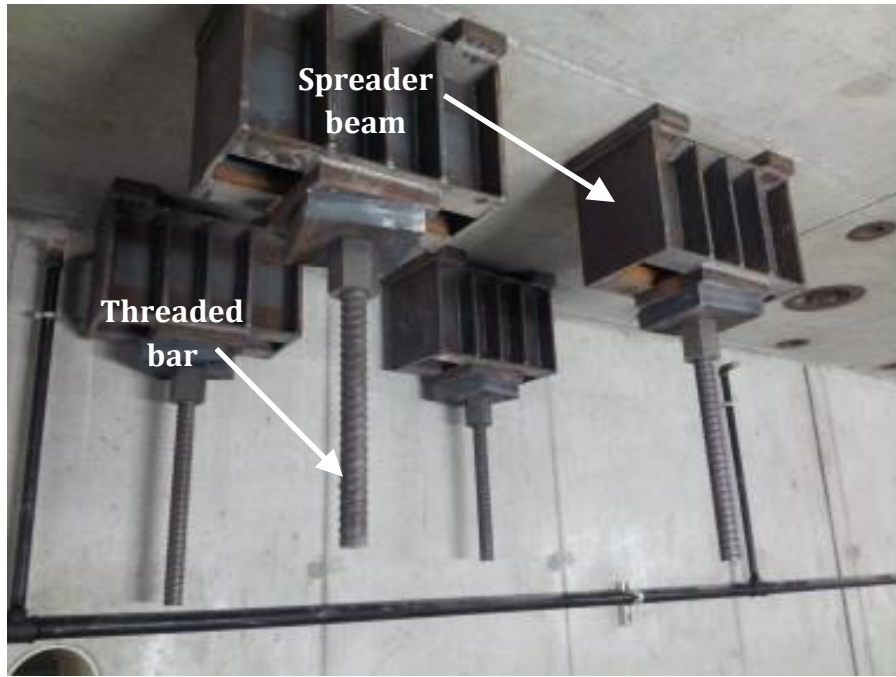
Steel spreader beams below laboratory strong floor for base block hold-downs
